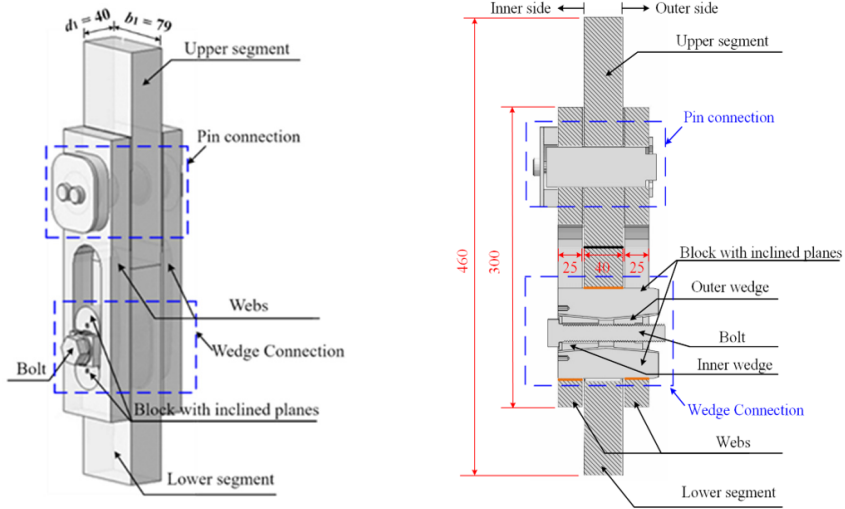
Illustration of a segment specimen (unit: mm)
